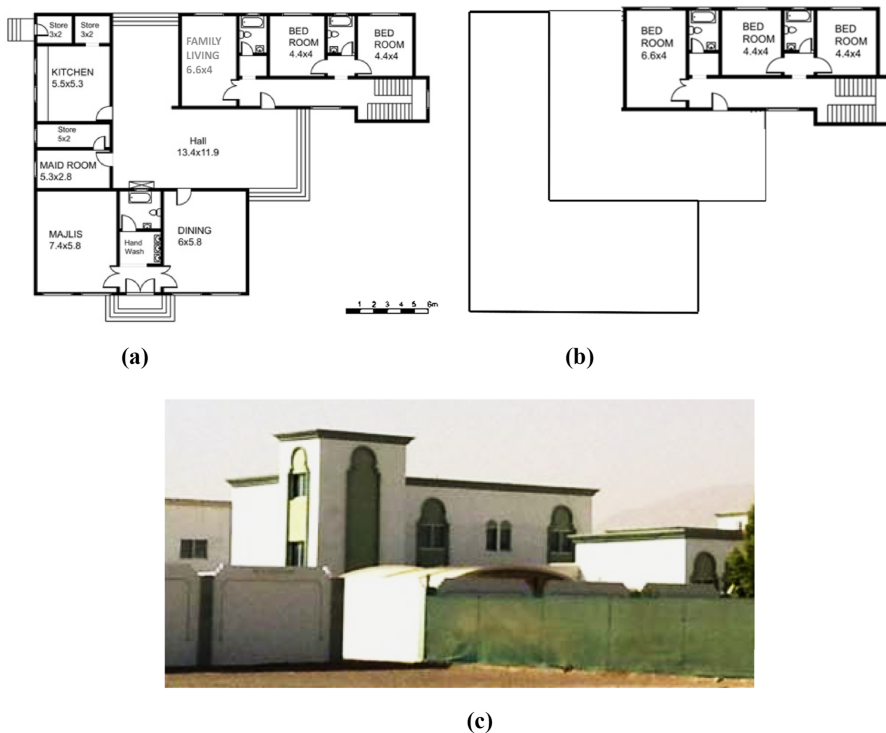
(a) Ground floor plan, (b) first-floor plan and (c) the façades of the selected case study house model. Source: Figure created by authors
